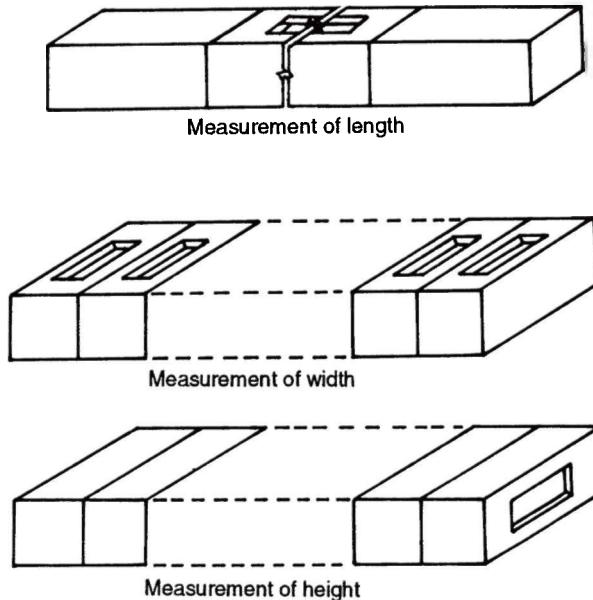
Measurement of Tolerances of Common Building Bricks
